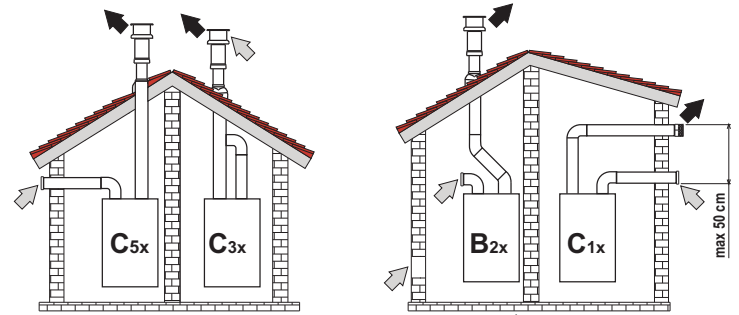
Examples of connection with separate pipes (⇨ = Air / ⇨ = Fumes)
